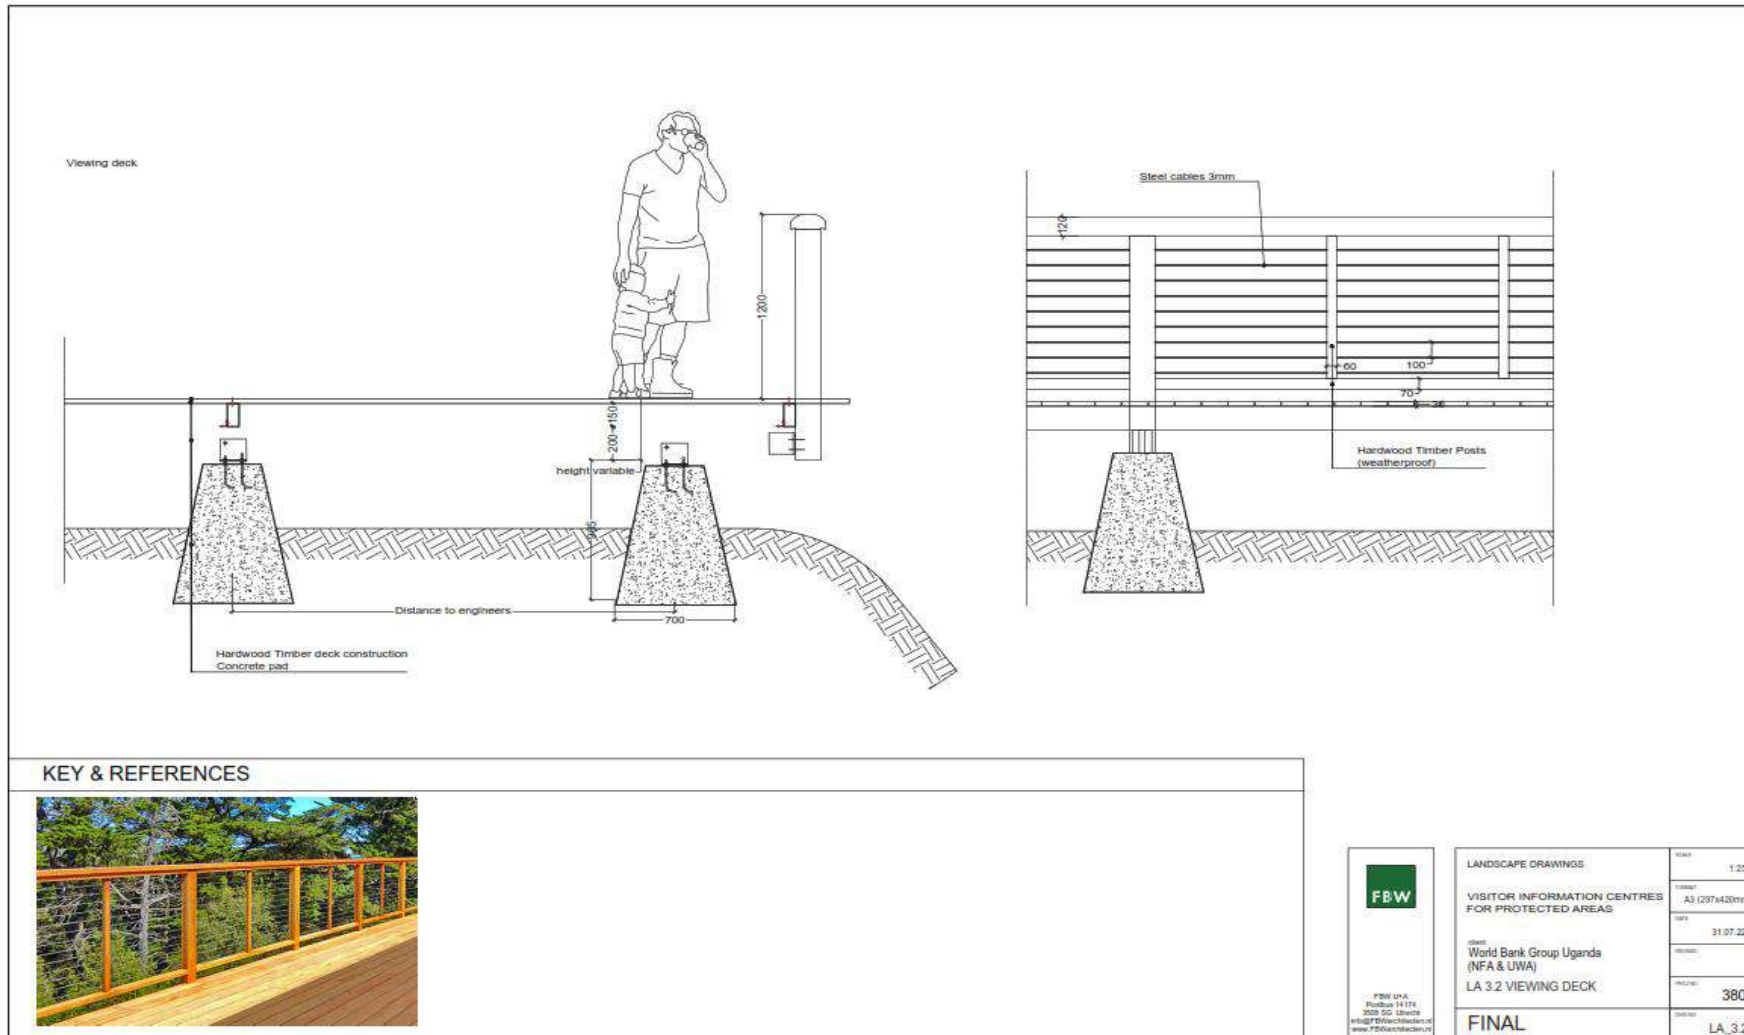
A cross section of the viewing deck at the proposed VIC
